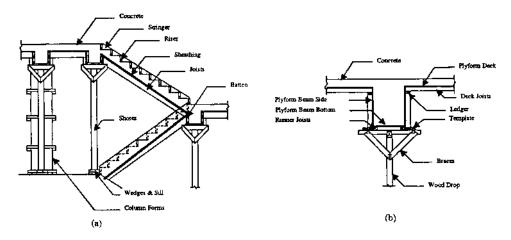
Typical methods of wood form construction for (a) concrete stairs and columns, and (b) concrete beams.
